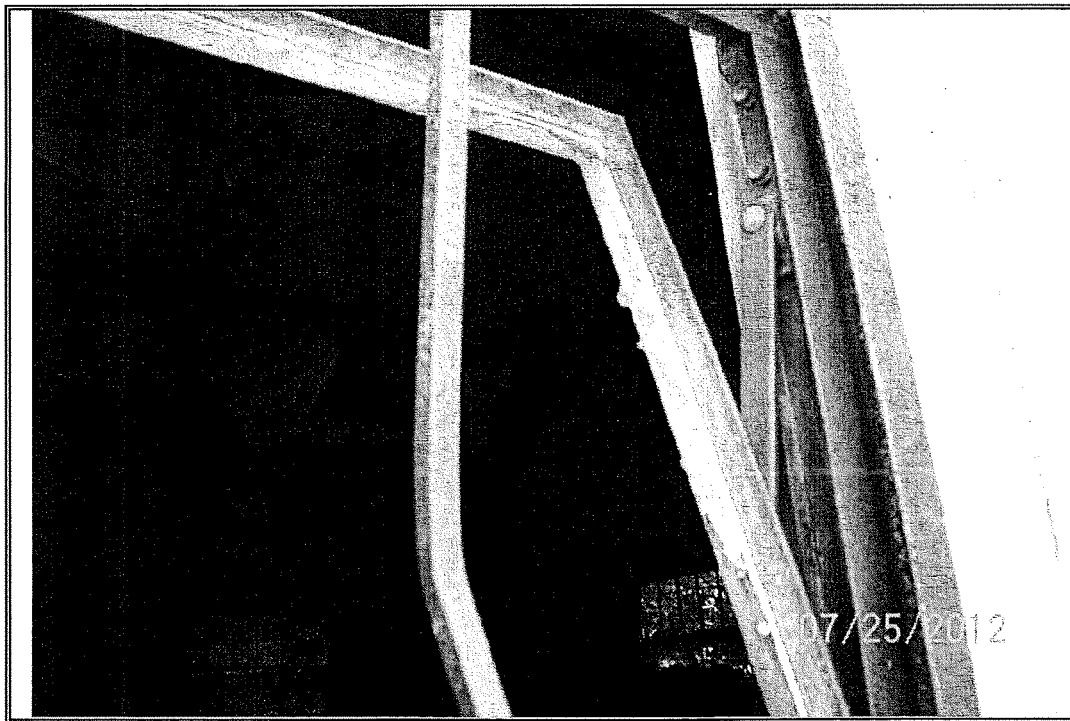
View of window glazing on M Bldg window. (2% CH).
